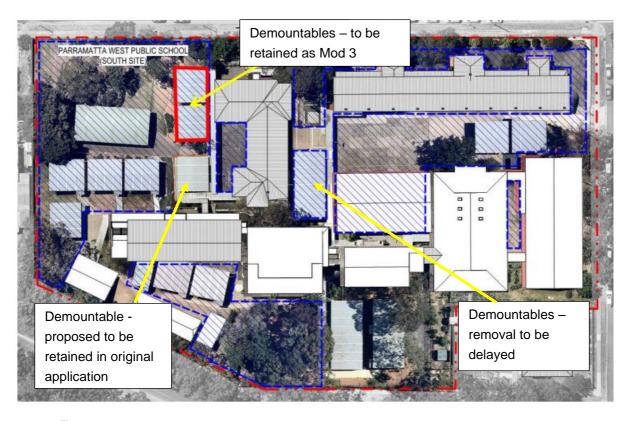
| Southern site showing demountable buildings to be retained and removed (Source: Dept of Education Modification Application, 2021)
